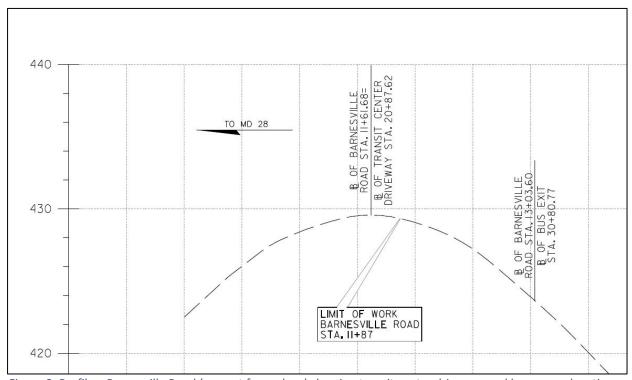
Profile – Barnesville Road (excerpt from plans) showing transit center driveway and bus egress locations
